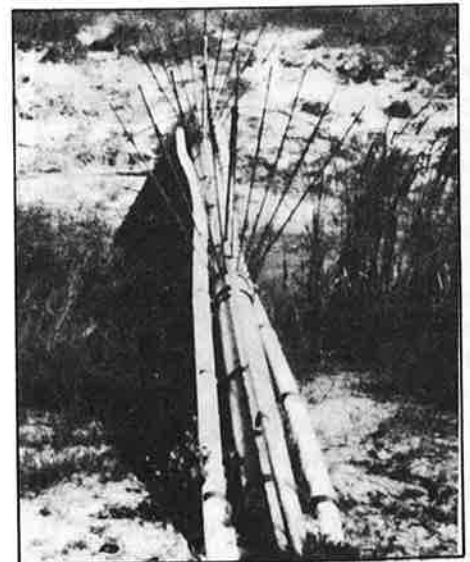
Water conduit crossing where authorized access to the crossing by company personnel is required.
